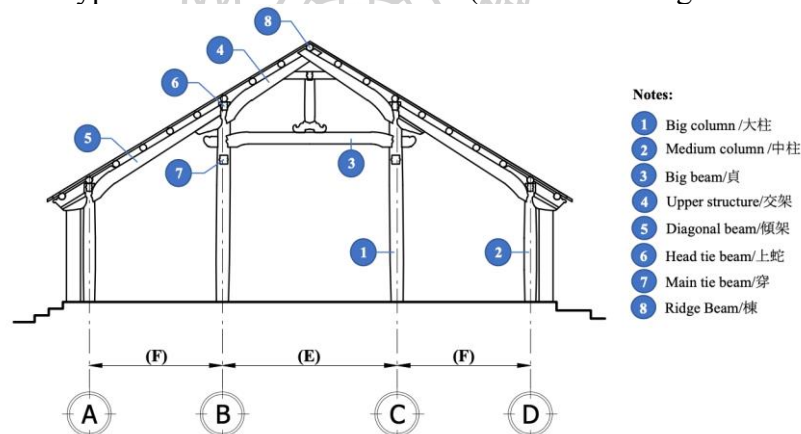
Timber frame terminology in the vertical section of the “single ridge beam” type in the “Ta Tra Gia” left house (“Dien Tho Cung” residence area)
